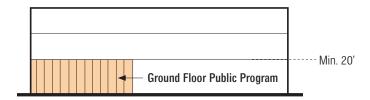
Ground Floor Height for Parcel E4
